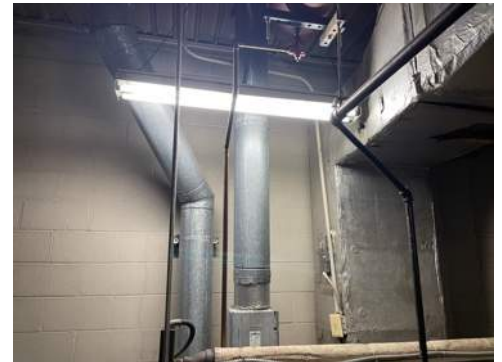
Boiler, Boiler Exhaust Flue is Assumed to Contain Asbestos
